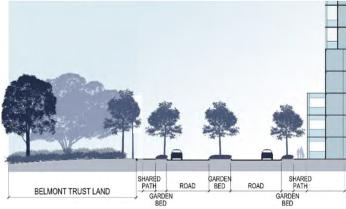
Resolution Drive and Stoneham Street (Plan Extract and Indicative Section)
